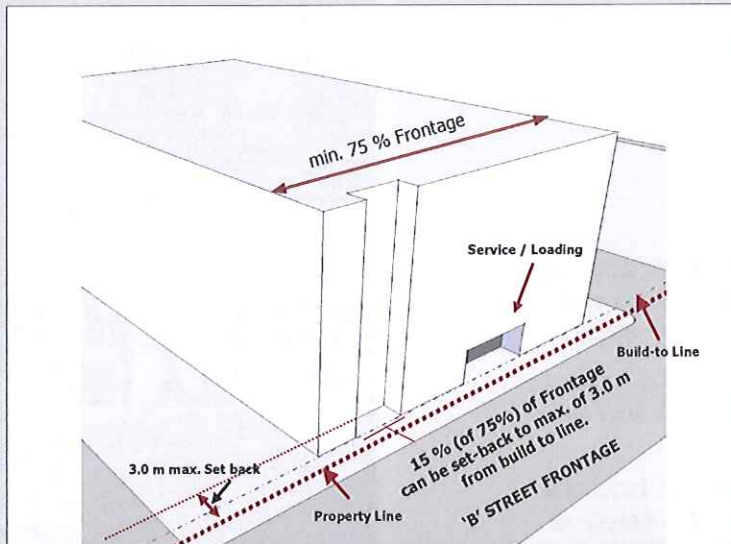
Illustration of a building streetwall positioned on a 'B' Street frontage.
